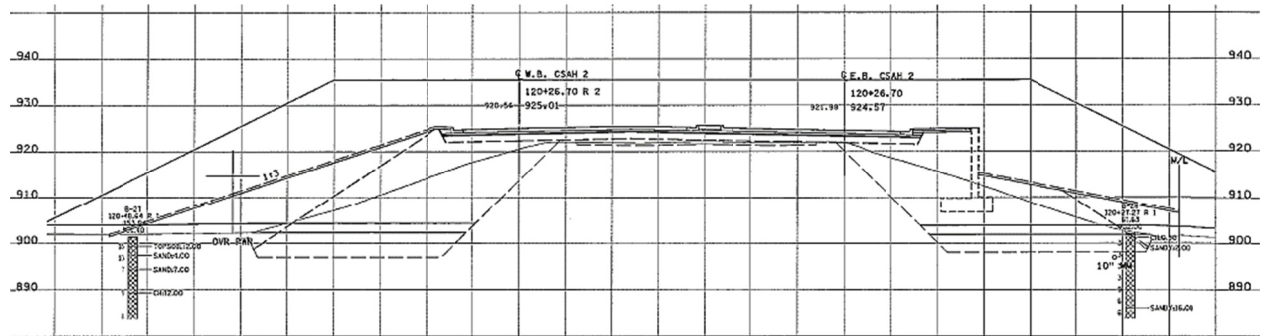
Compressible soils at the site were preloaded with a soil surcharge to reduce future roadway settlement in the vicinity of the west abutment of Bridge 82527.
